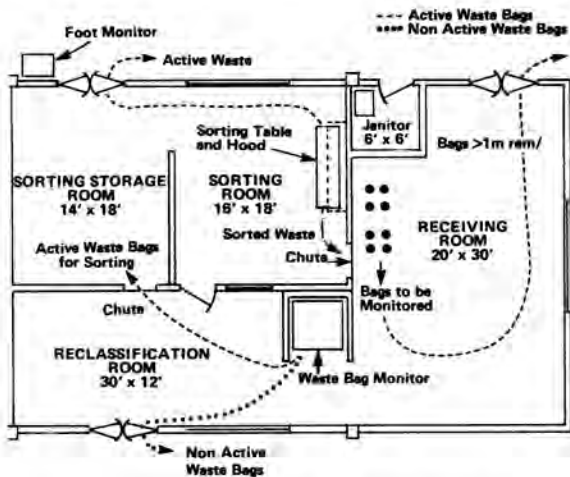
Proposed Waste Handling Area for Bruce NGS-B
